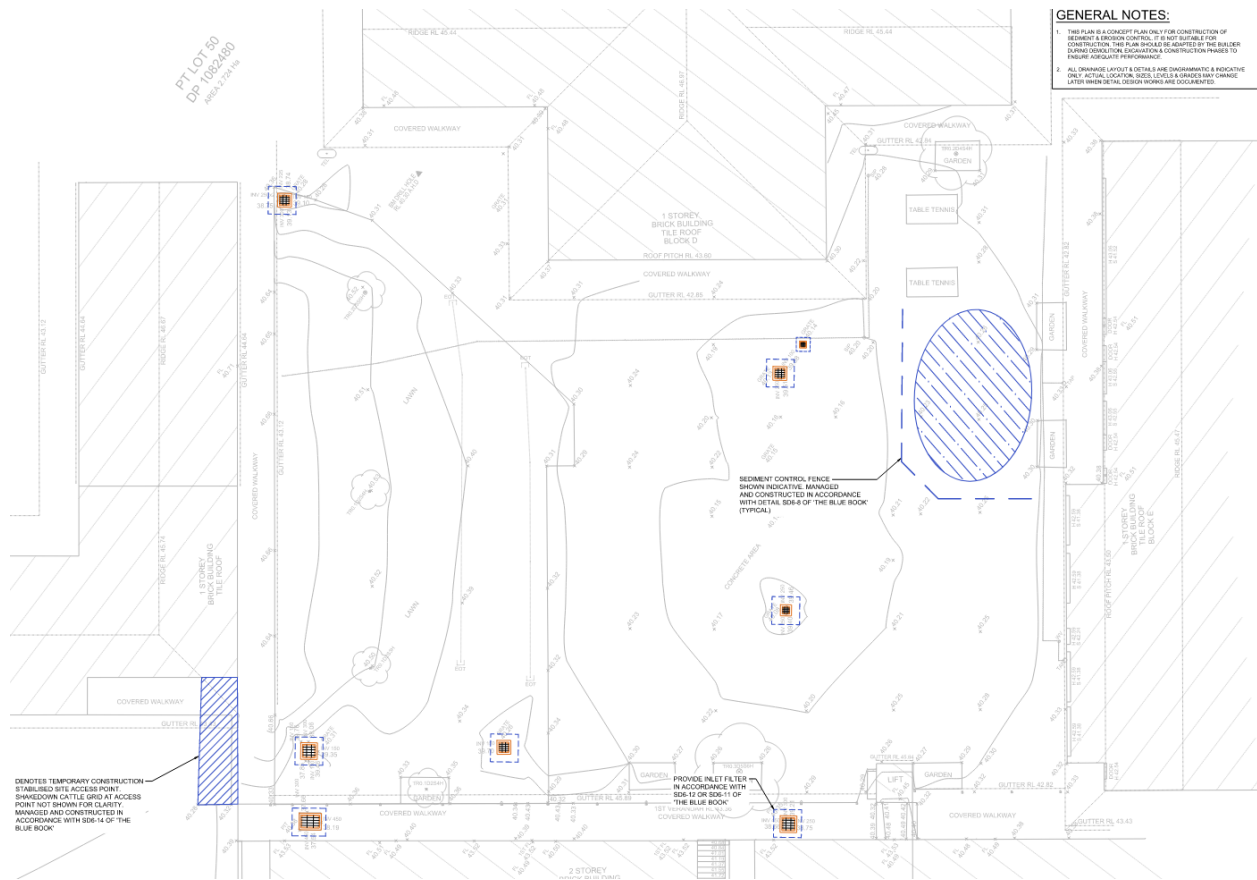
Sediment erosion control plan (Source : Birzulis drawings C.11 : Scale 1:100)
